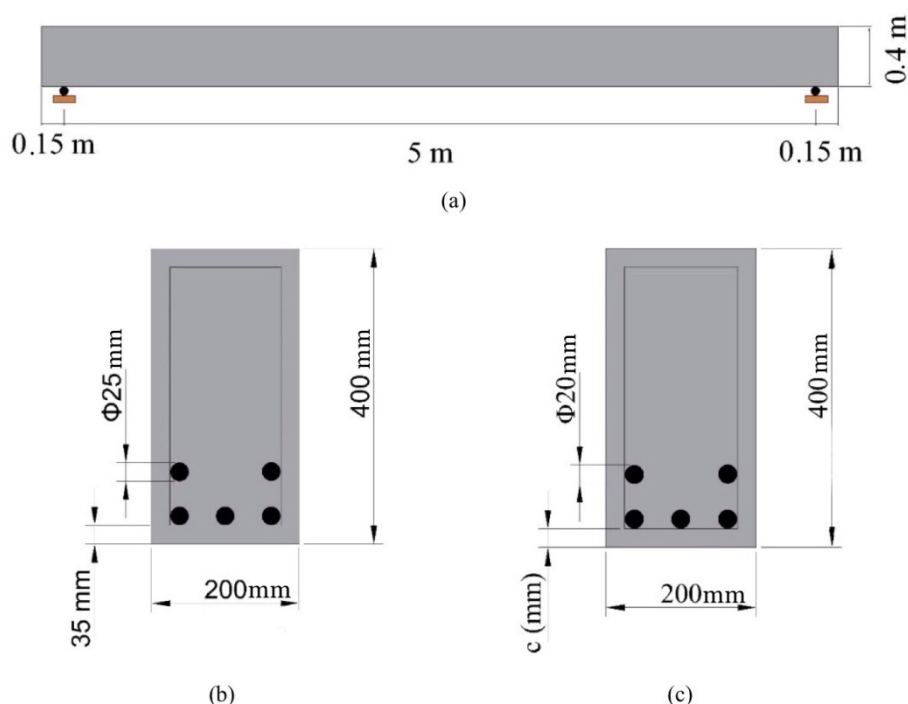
a) Beam model used to estimate crack opening b) cross-section beam bar $\Phi 25$ mm c) cross-section beam bar $\Phi 20$ mm.
